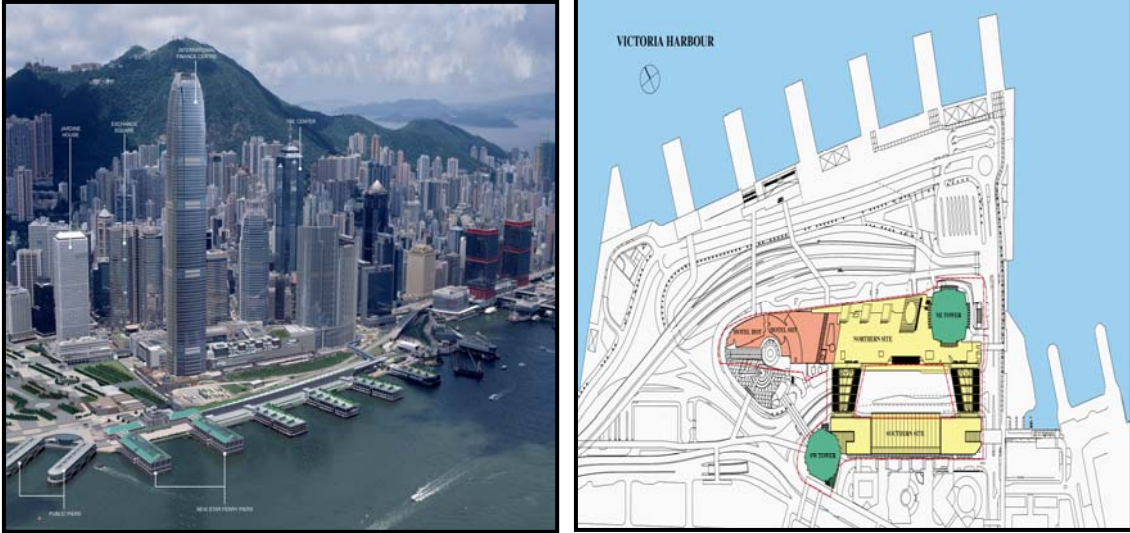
International Financial Centre Tower at Hong Kong Station, Hong Kong's Tallest Building. MTRC owns 18 floors of the office tower as an in-kind asset.
